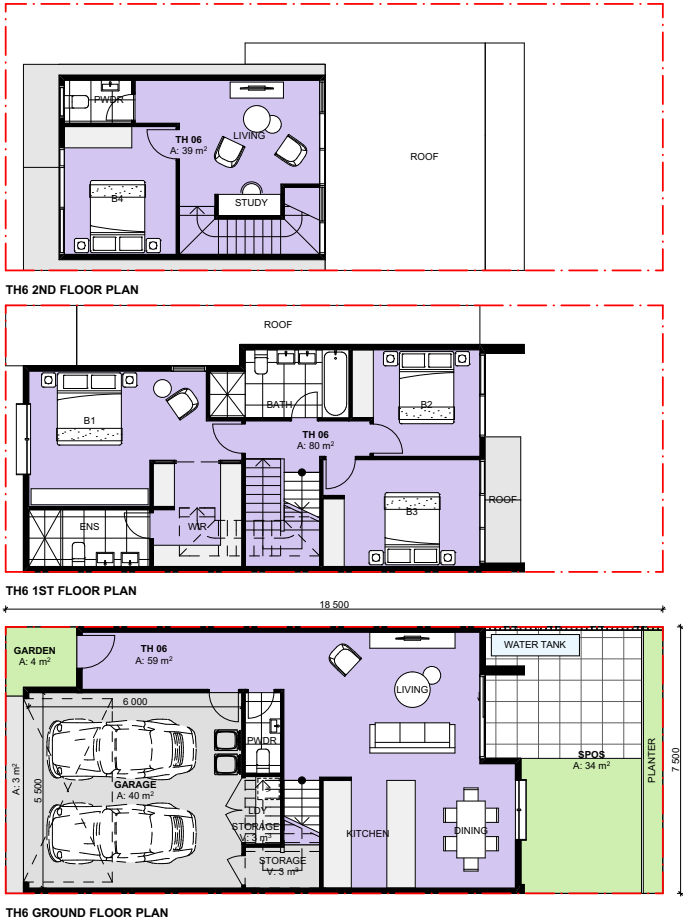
Townhouse Type 06 (Source: Plus Architecture)
